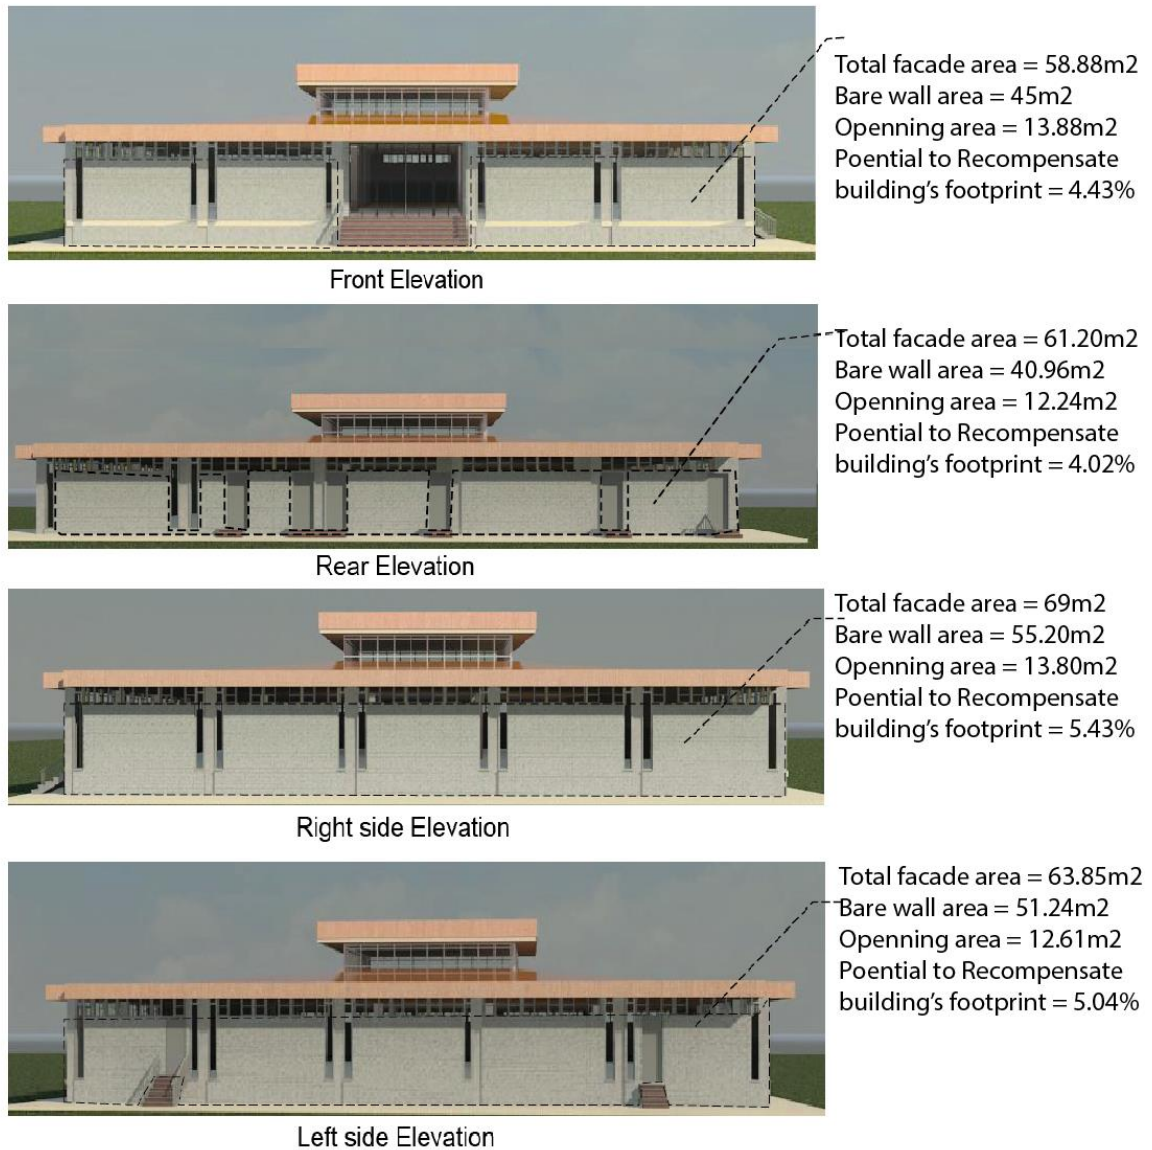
External surfaces bare wall potentials of Library building, (Source: Author)
